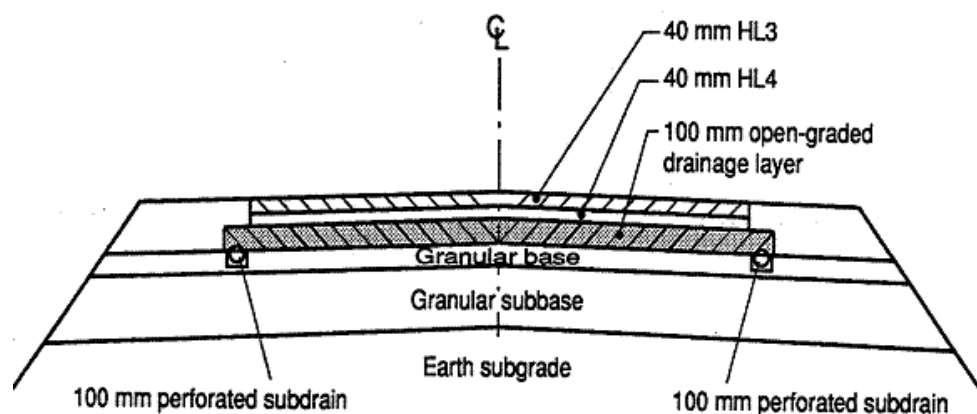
Typical cross-section of subsurface drainage system (MTO 2013).
